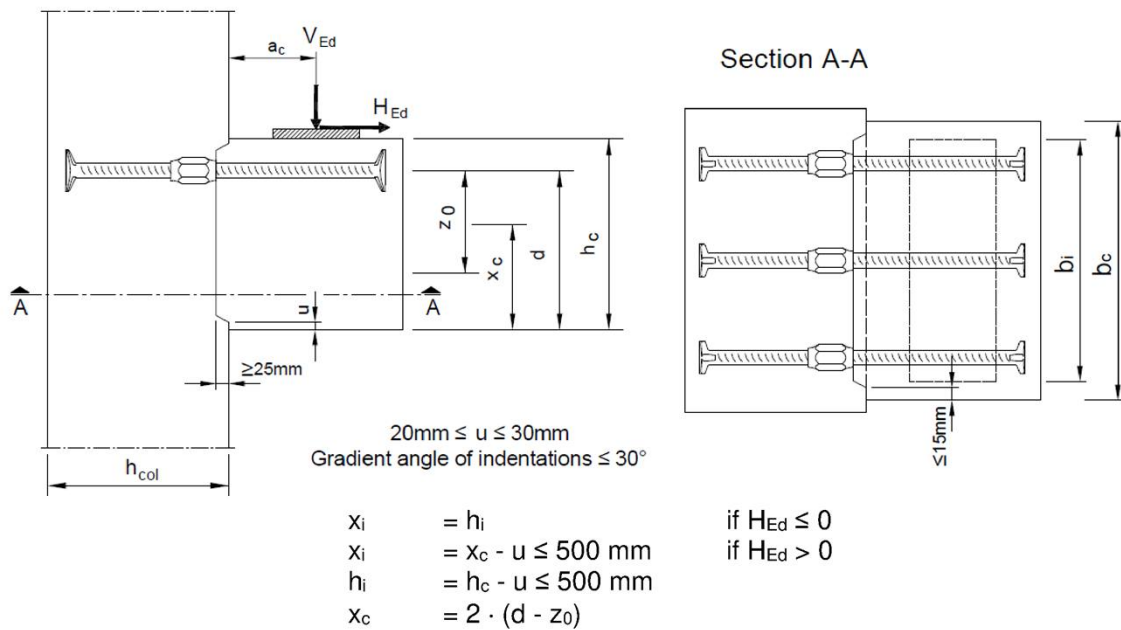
Dimensioning and detailing of single indented construction joints (Type B)
